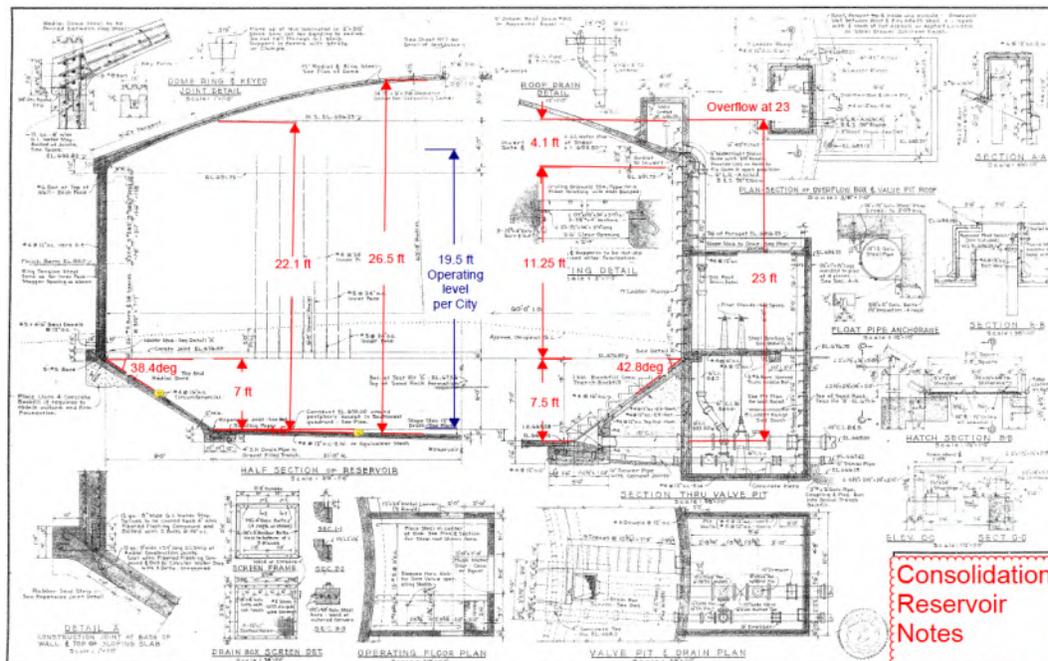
Consolidation Reservoir Sections and Details (Drawings are based on 40th St)
